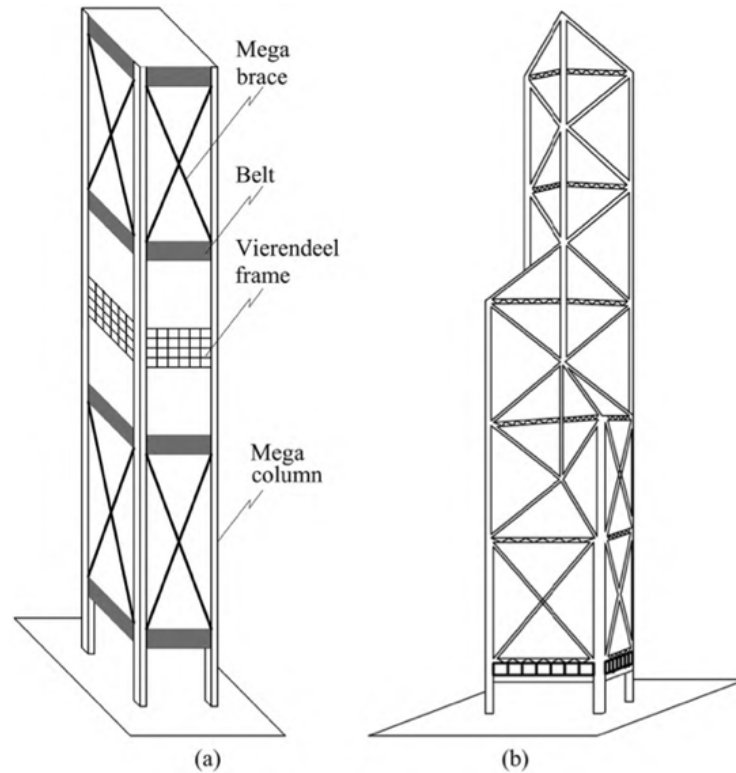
Representations of Mega Column Systems: (a) Mega Frame System; (b) Space Truss System (source: [2])
